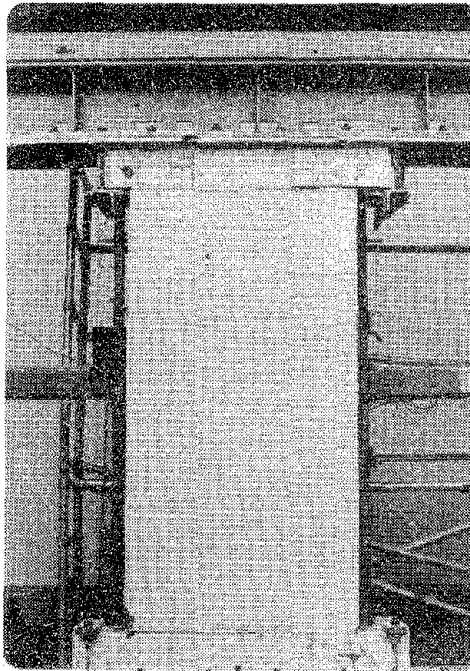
SECOND SINGLE PIER TEST SET UP
